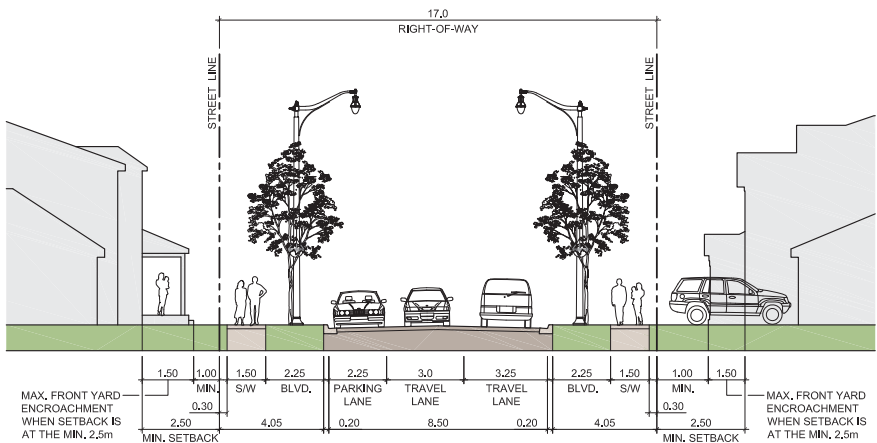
Low Density Residential / Local Road Streetscape - 17.0m R.O.W. / 2 travel lanes / on-street parking on one side / 4.05m boulevard
